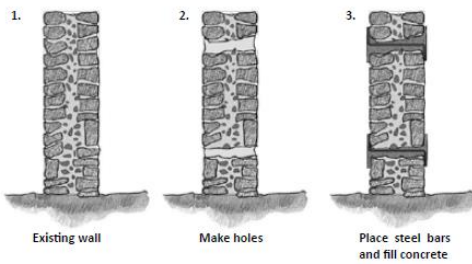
Installation of through-wall anchors in stone masonry walls after the 2002 Molise, Italy, earthquake (source: Maffei et al. 2006)
